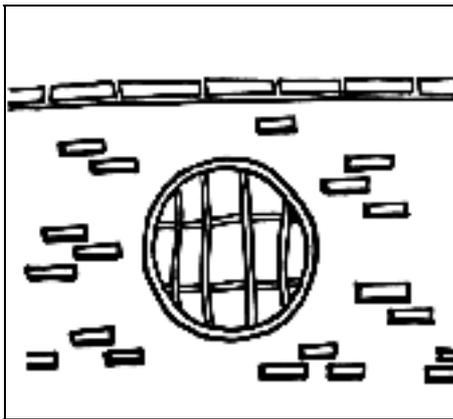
An example of walling with “feature” railing panels allow limited views through.
